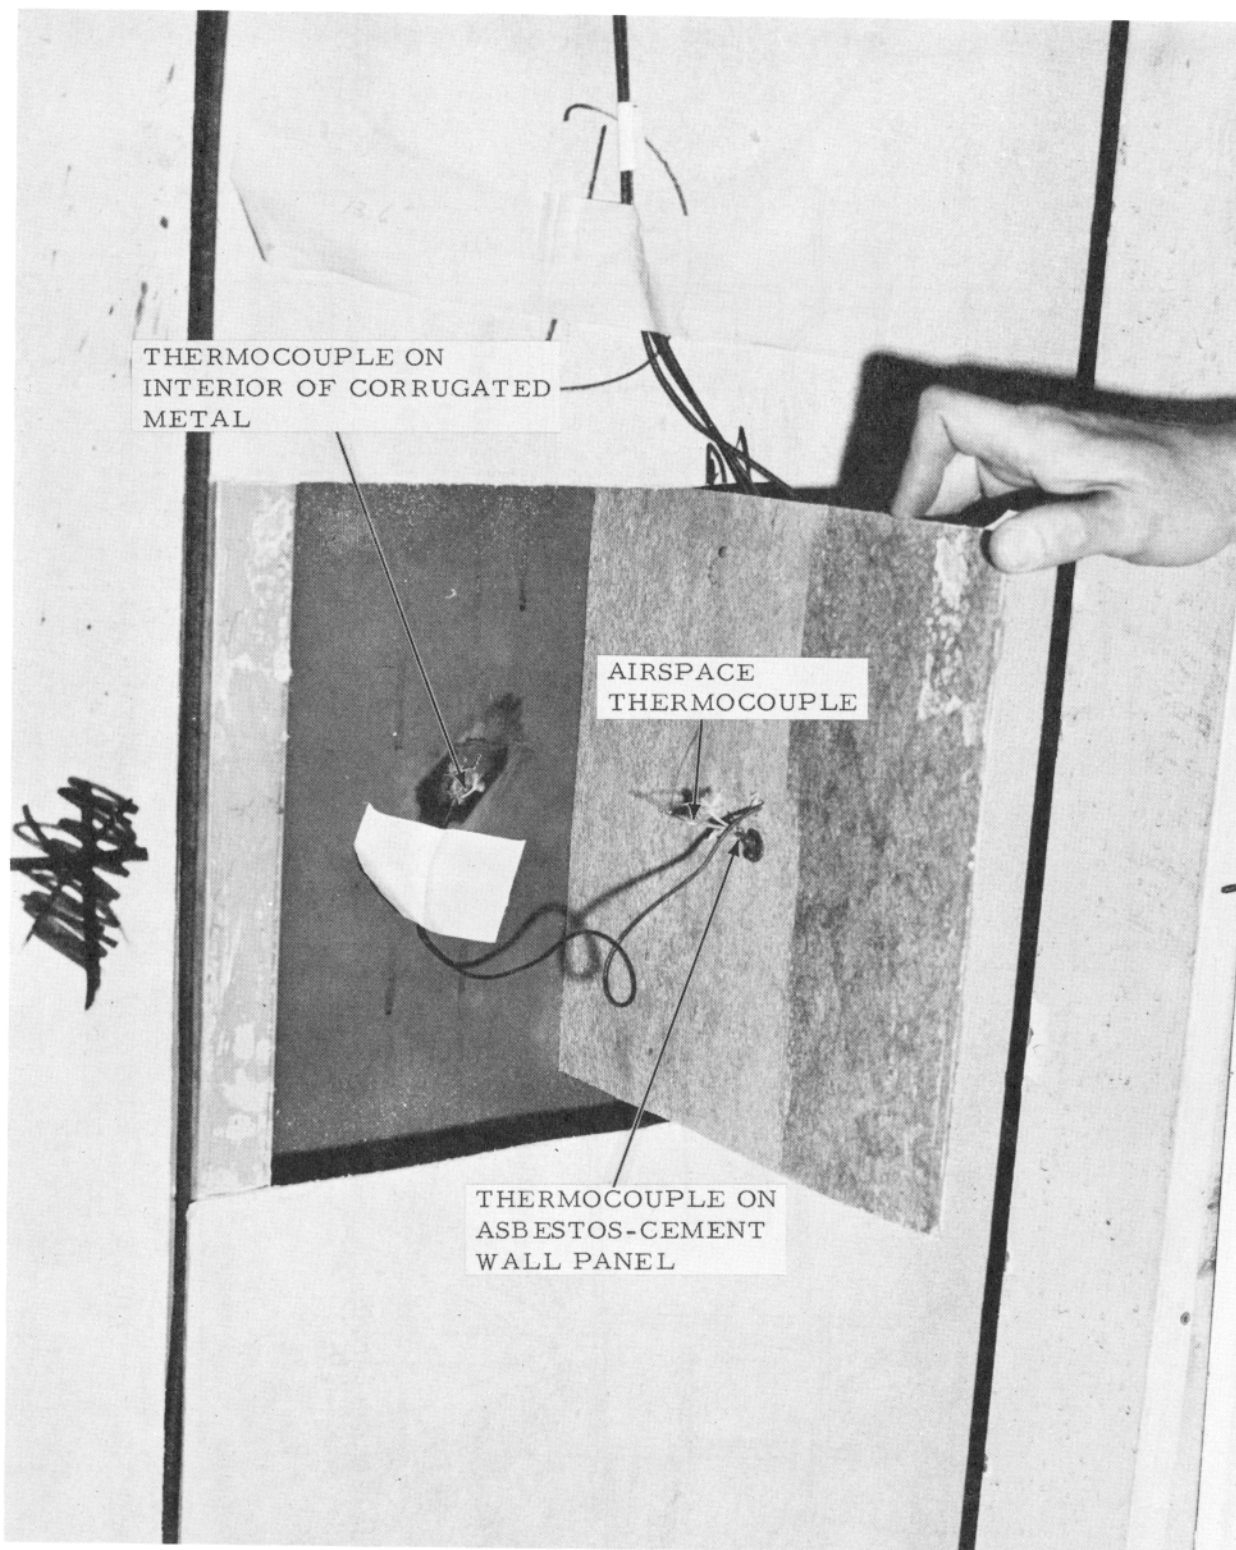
TYPICAL THERMOCOUPLE INSTALLATION ON THE INSIDE OF THE EXTERIOR METAL WALL SURFACES
